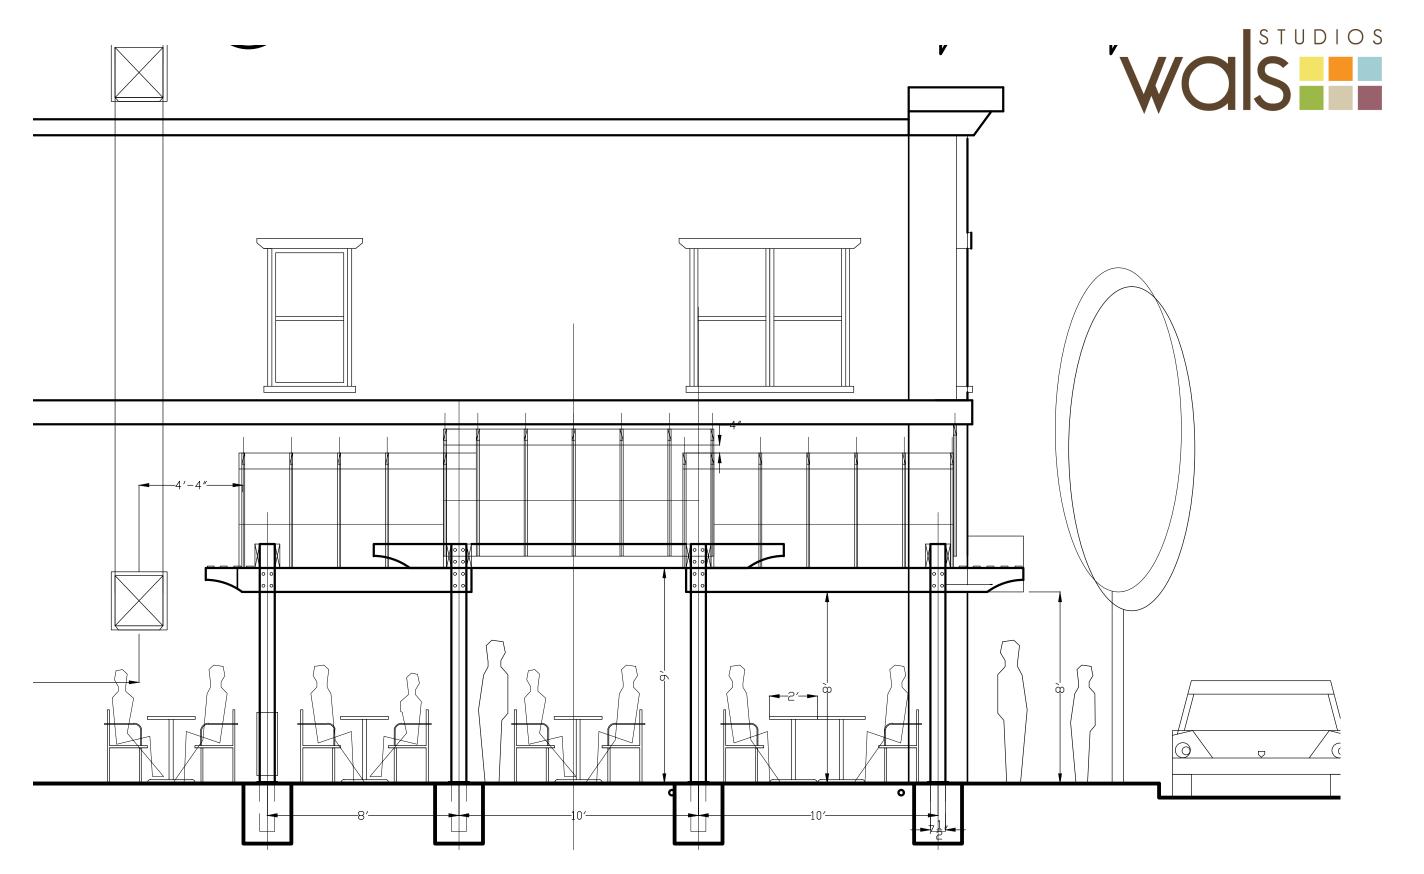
EXHIBIT A: PERGOLA / ALLEY PLAN - PROPOSED
